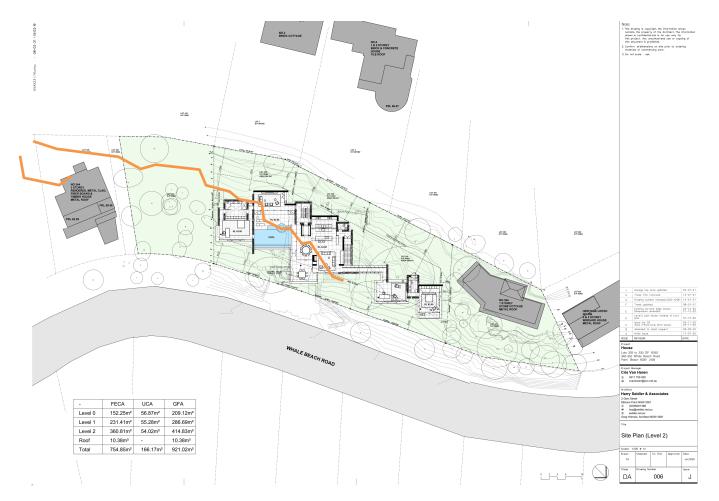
Site Plan. Proposed new residence across Lots 328, 329 and 330, numbers 346-350 Whale Beach Road, Palm Beach. Orange line indicates approximate rock faces.
